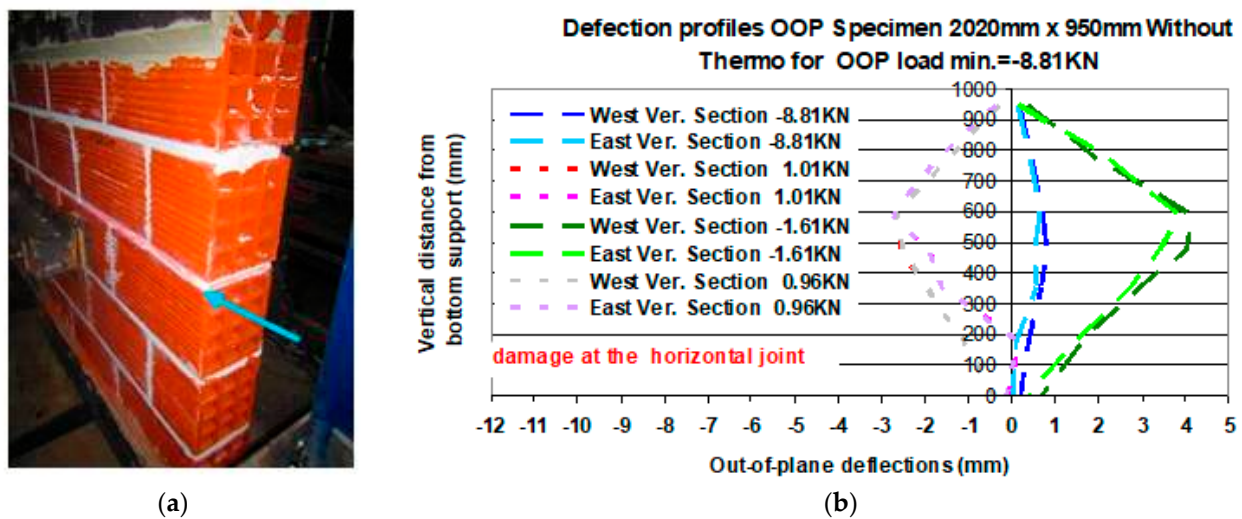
(a-left) “Bare” wallet crack pattern. (b-right) East and West vertical cross-section out-of-plane horizontal displacement profiles for certain distinct stages of the out-of-plane. Horizontal load applied to the “bare” masonry wallet without thermo-insulating attachment.
